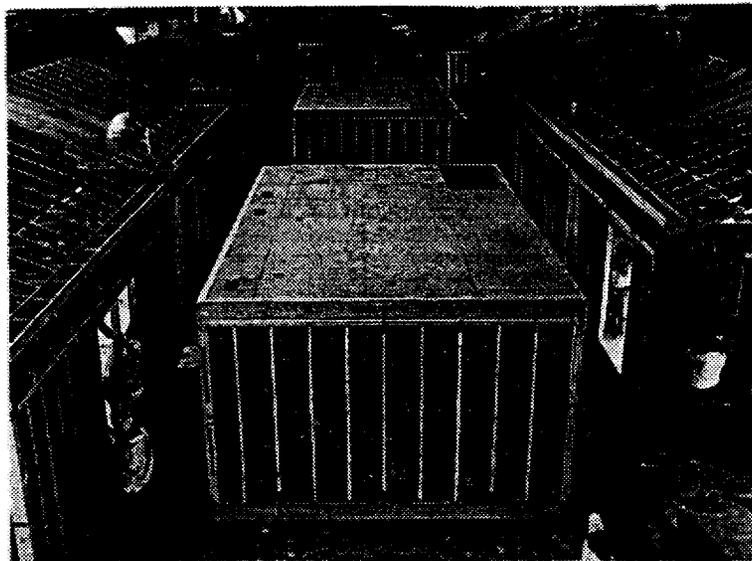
Modular Units Showing Floor and Ceiling on Each Box.
